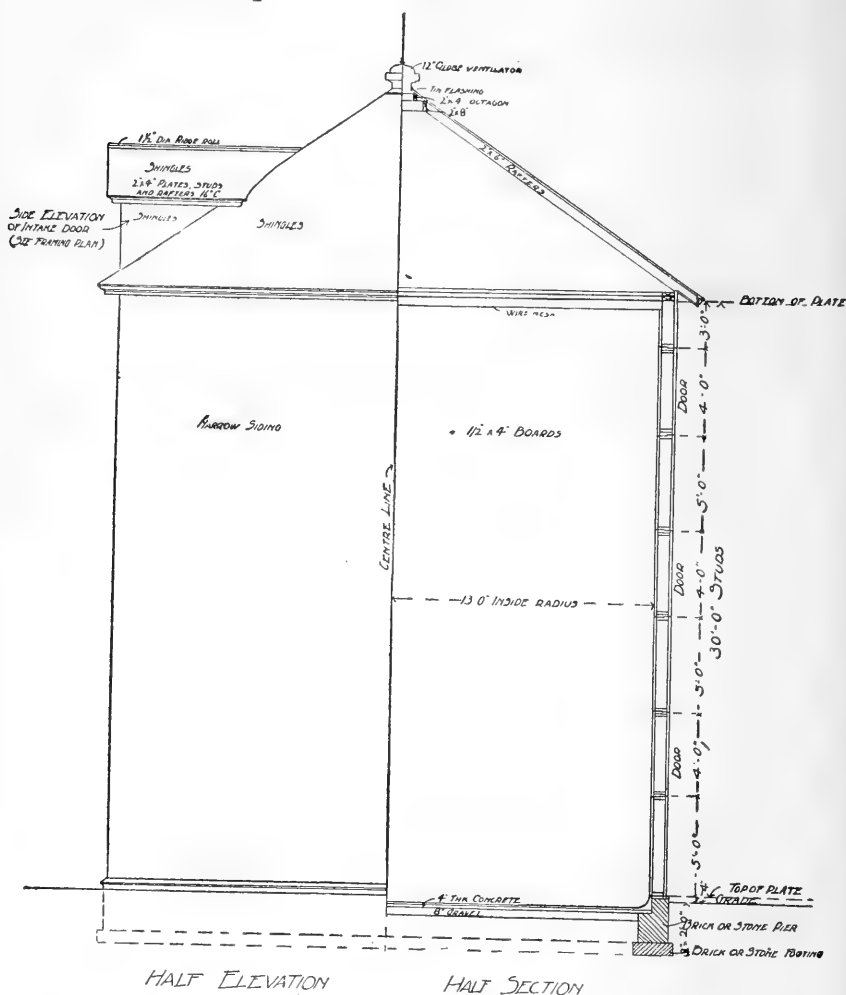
ELEVATION AND SECTION OF ROUND WOODEN SILO.
